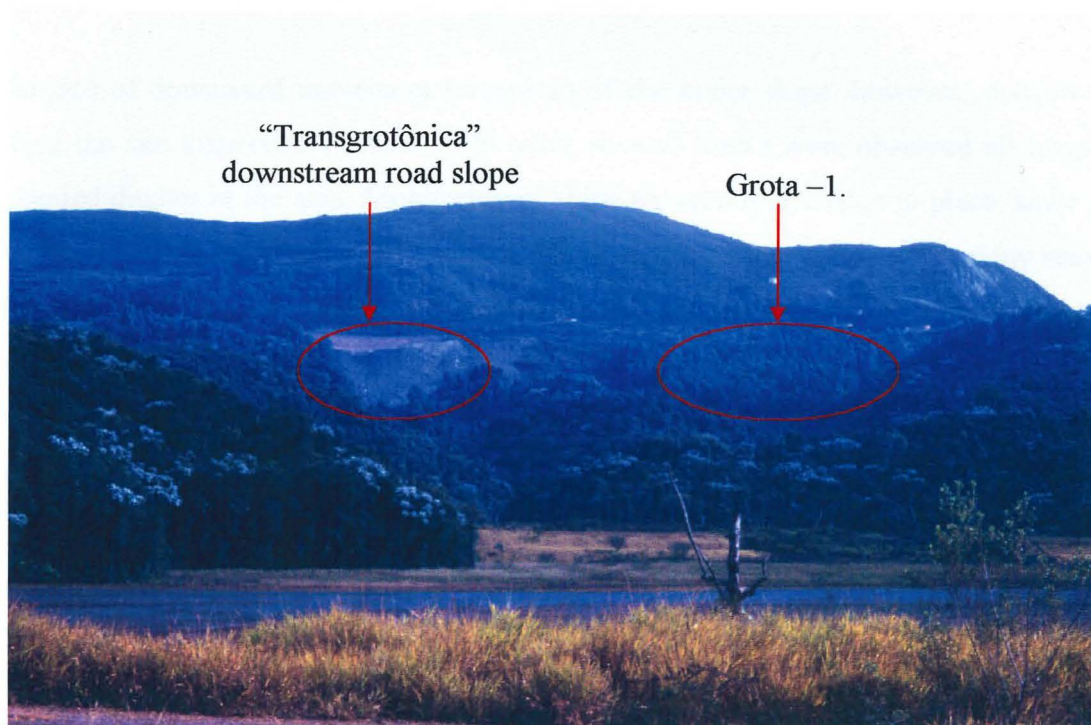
View of the Downstream Slope of the Transgrotônica Road where Cracks were Observed.
